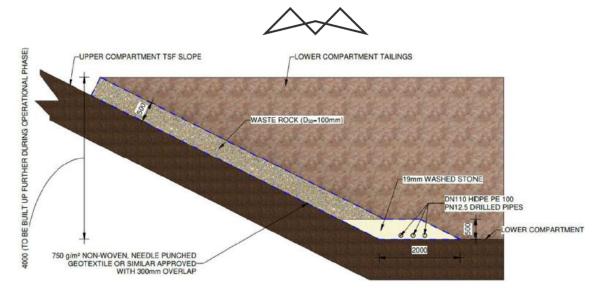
Typical Toe Drain Detail (Eco Elementum, 2025)
